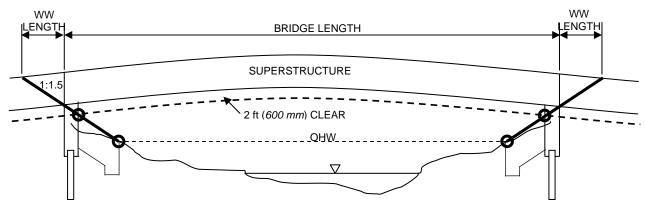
Defining Bridge Geometry from proposed channel slopes with parallel wingwalls.
